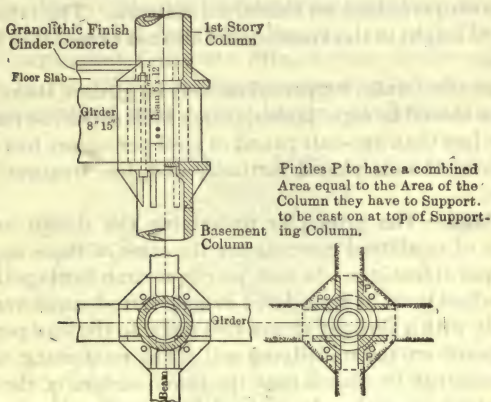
Detail of Connection of Cast-iron Column and Concrete Floor System.
